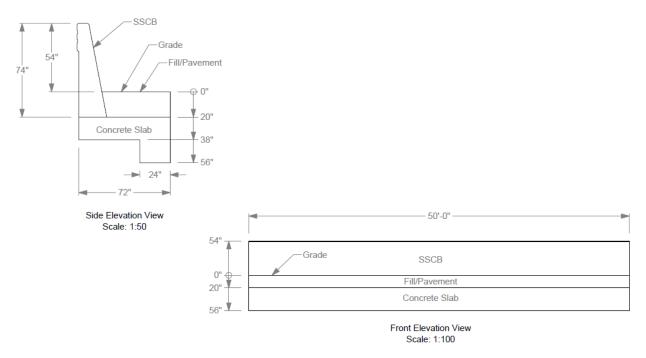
Concept 7 – Moment Slab with Concrete Beam and Overlay Design.
